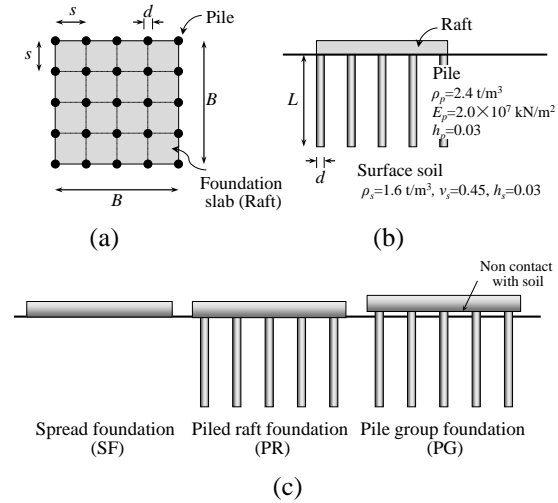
Analytical model; (a) plan view; (b) elevation view; (c) foundation type
